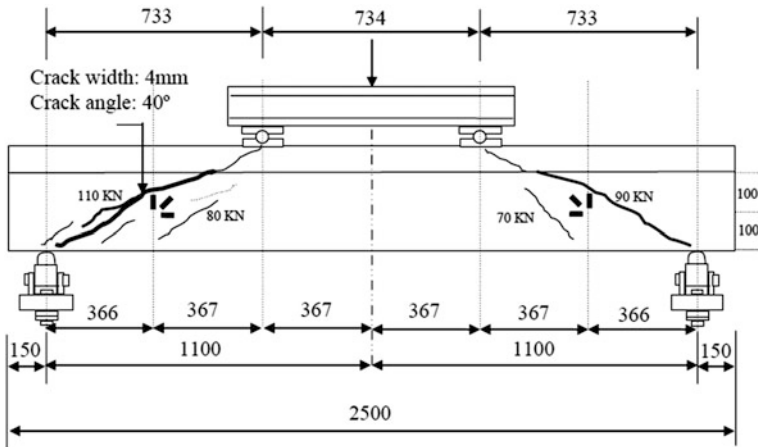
Schematic diagram showing cracking pattern of specimen S300-0L-2
